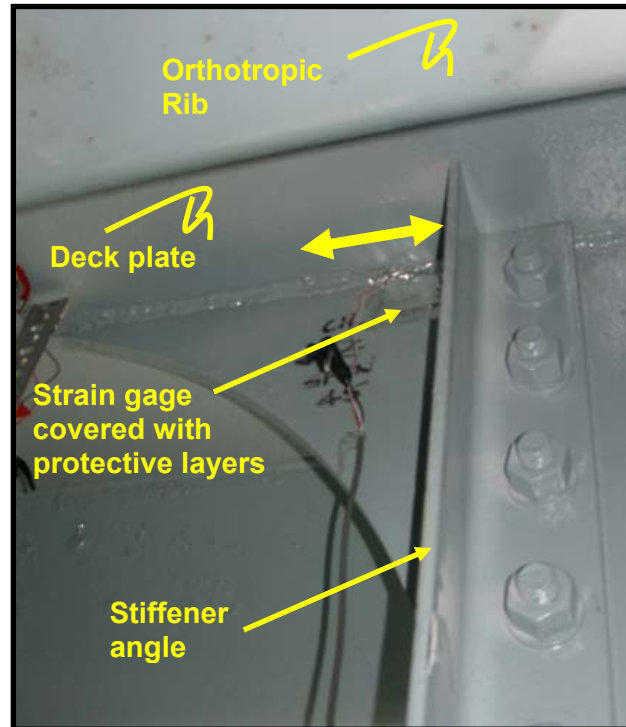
Strain gage CH_39 installed on the web plate of the north shear connector near the north end of the connector and longitudinally along the longitudinal weld used for attaching the shear connector to the bottom face of the deck steel plate in Span 45 (view looking east)
